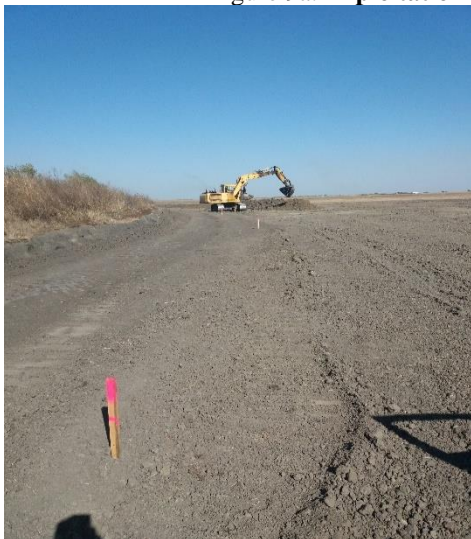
Road and gutter reconstruction - Photo by Marin Ilca
